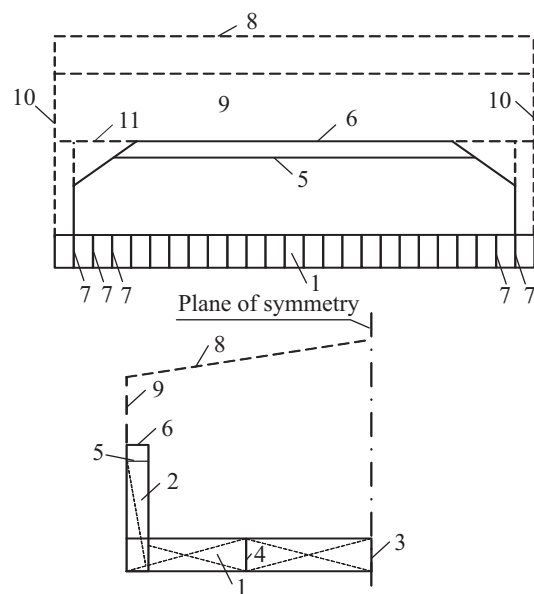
Ecological floating dock : 1 – pontoon, 2 – dock side wall, 3 – longitudinal bulkhead in the dock PS, 4 – side longitudinal bulkhead, 5 – safety deck, 6 – upper deck, 7 – transverse bulkheads, 8 – roof, 9 – side walls, 10 – front walls, 11 – running rails .
